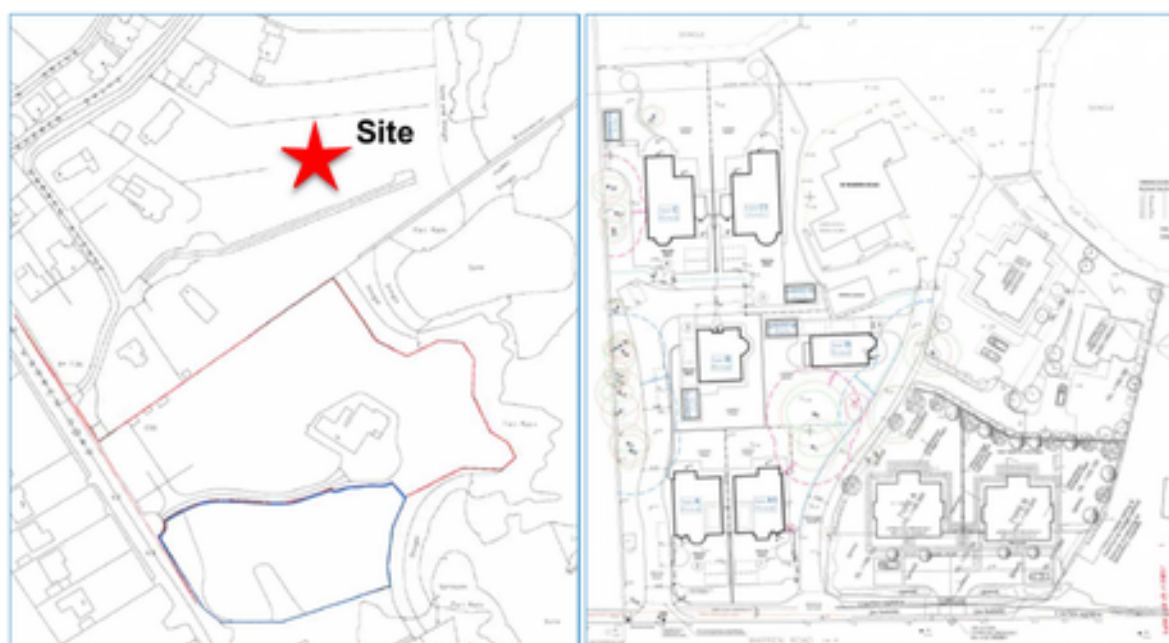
Previously approved residential development adjacent to 35 Warren Rd
